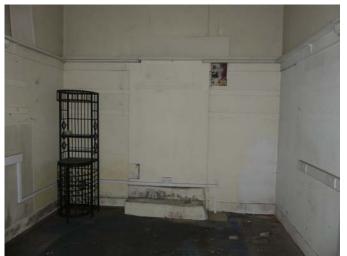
(left): Chimney breast on the west side of the southern front ground floor room
